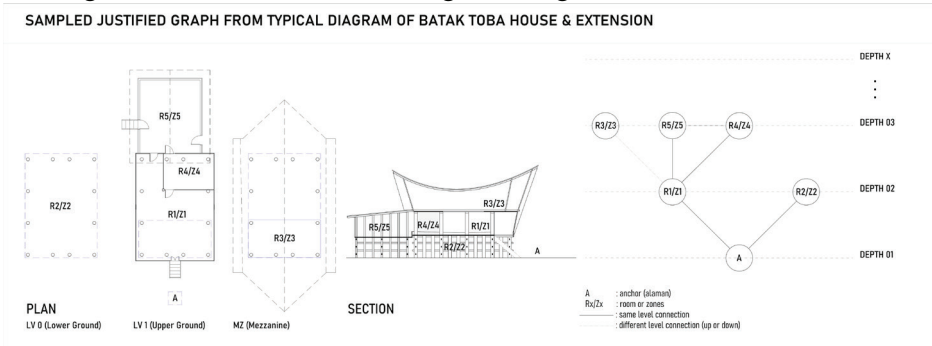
Sampled Justified Plan Graph of a Typical Batak Toba House and its Extensions.
